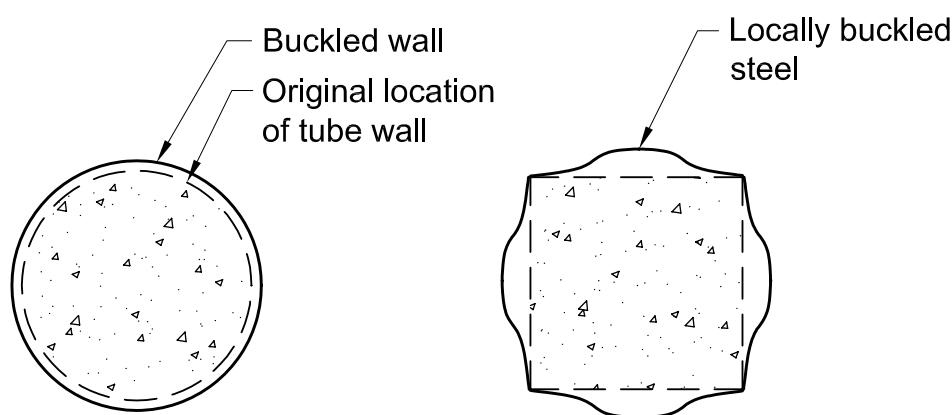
Cross-sectional buckling mode with concrete infill.
